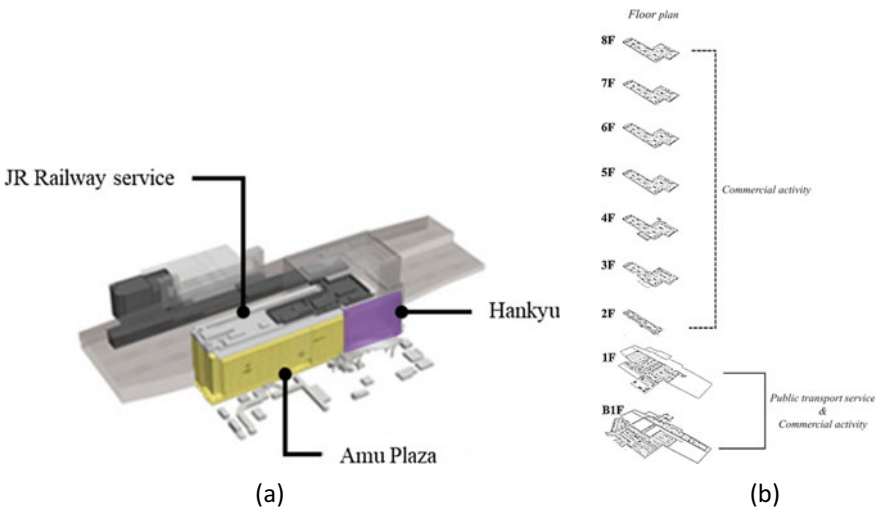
Space use in Hakata station building. a Retail operators. b Layout of Hakata station building
